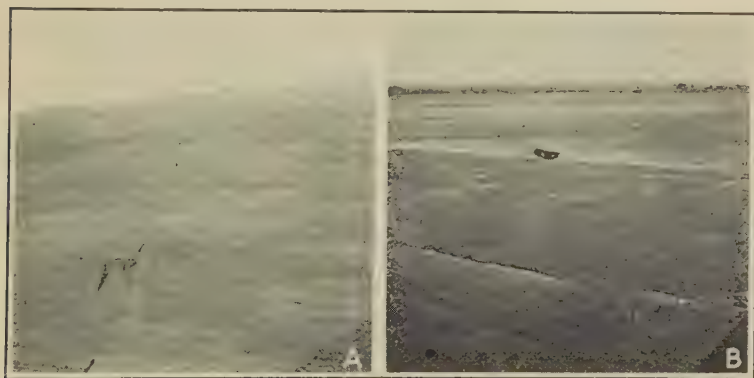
DAM B. CYCLOPEAN CONCRETE ABOUT THE SAME AGE AND EXPOSURE AS THAT IN DAM A.
